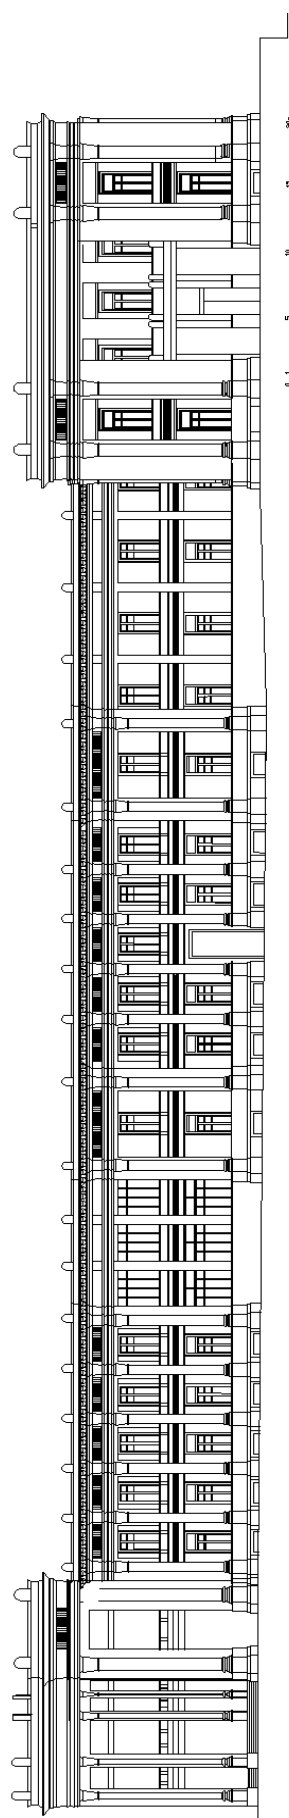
ELEVATION PLAN FROM VIA CONSOLATO DEL MARE
